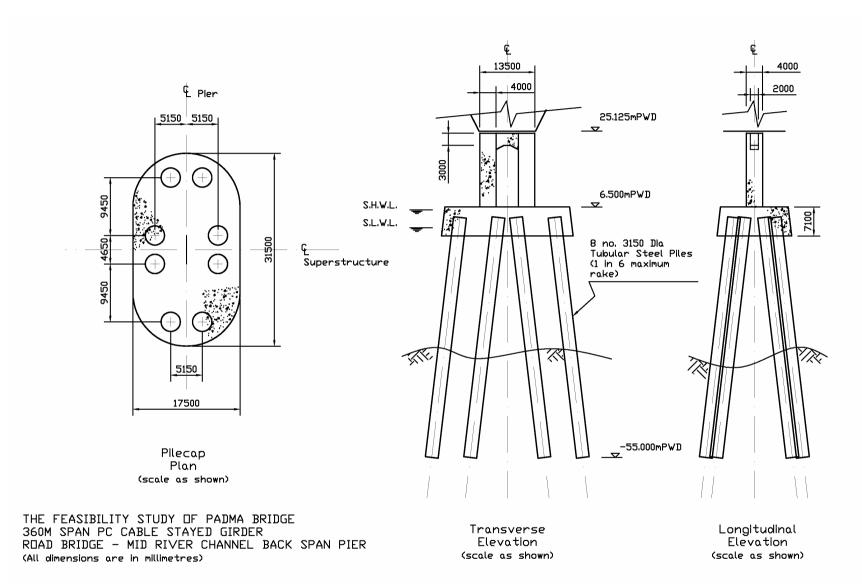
Mid-River Back Span Substructure General Arrangement (Alternative-H2)
